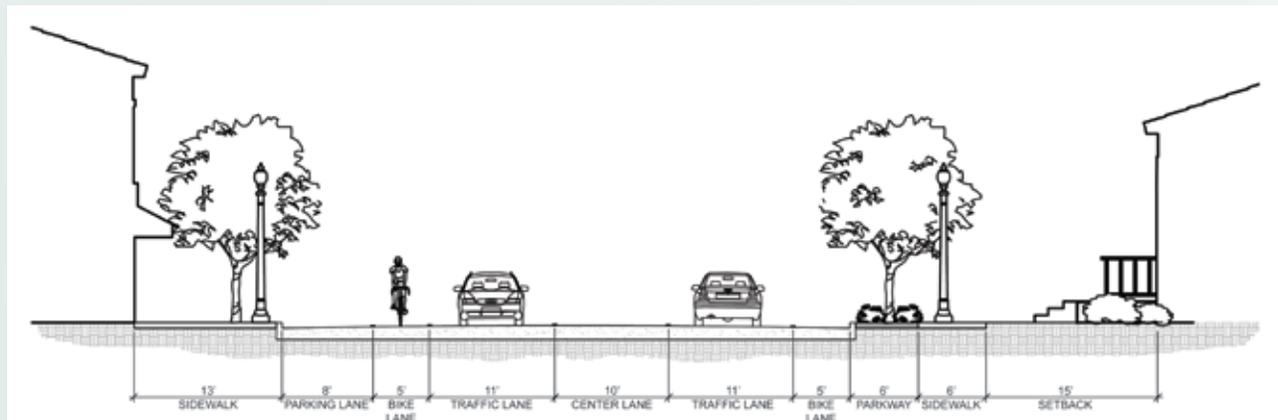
Proposed cross section of 1st Street between Pacific Coast Highway and Orange Avenue
